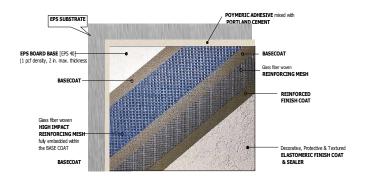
Typical EIFS Cross-Section with an EPS Substrate.
